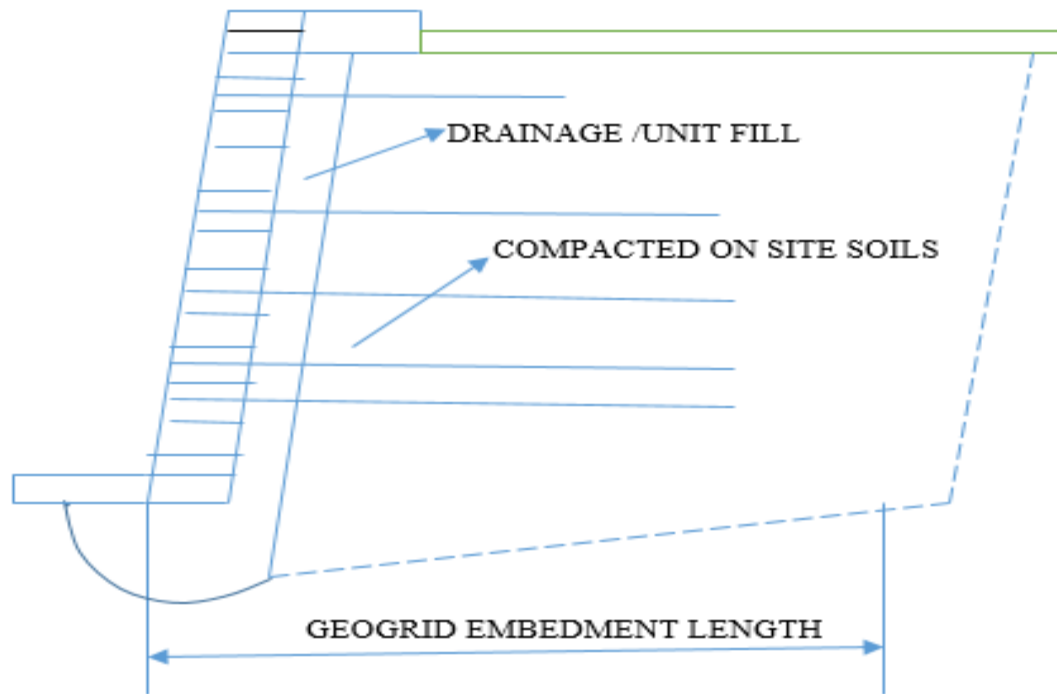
Arrangement of Geogrids in Retaining Walls (Bonaparte, Holtz and Giraud 1987)
